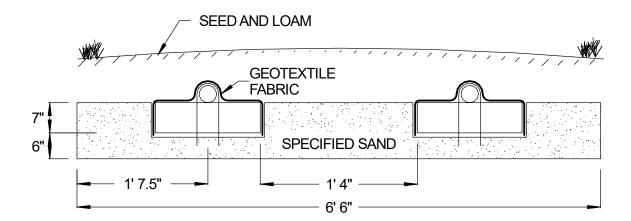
SECTION VIEW - BED SYSTEM - LEVEL SITE
